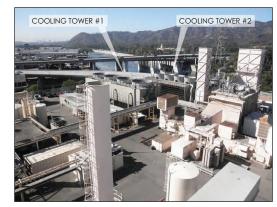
Overview of Project Area from Roof of Grayson Boiler Building Looking Southwest
